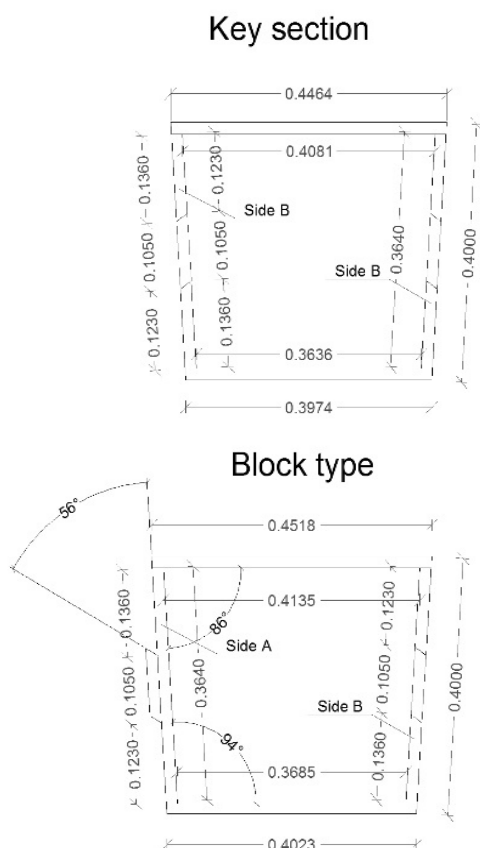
Executive drawings of the blocks with the connecting system by mean of male-female joints.
